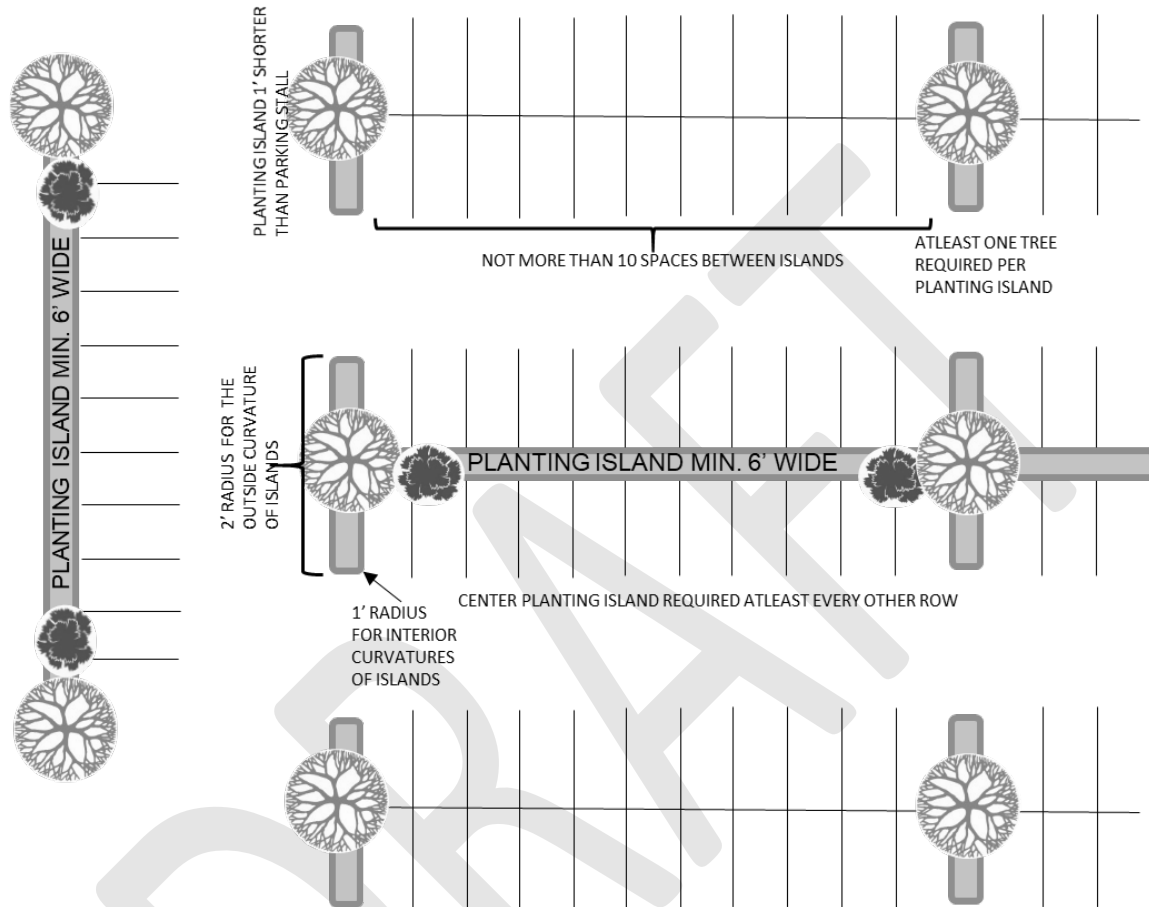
Illustration of Parking lot Design for 30-49 spaces
